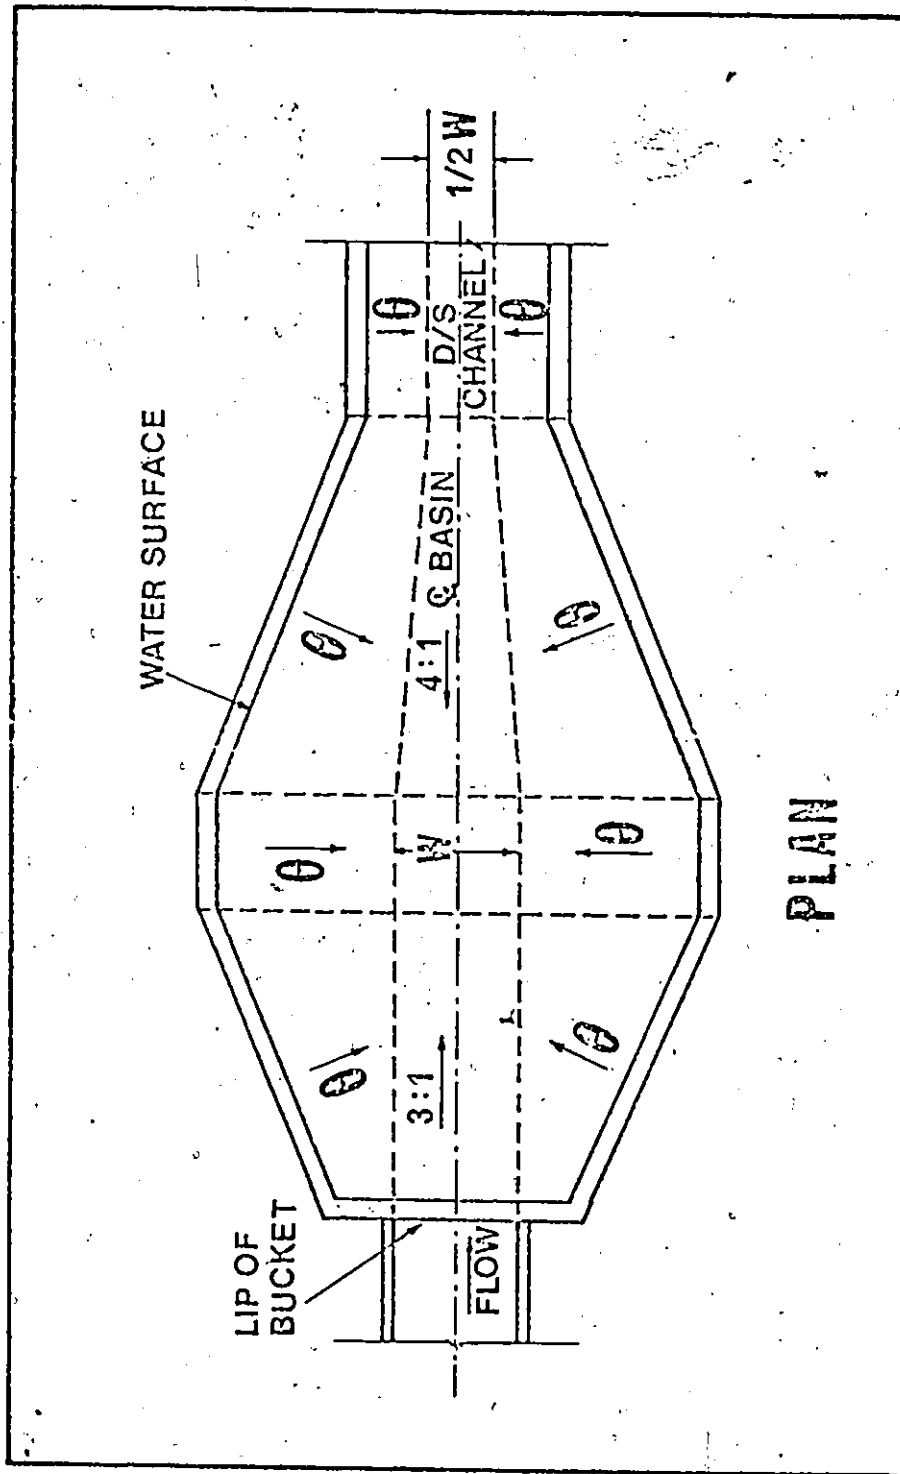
PLAN OF RECOMMENDED PLUNGE BASIN
